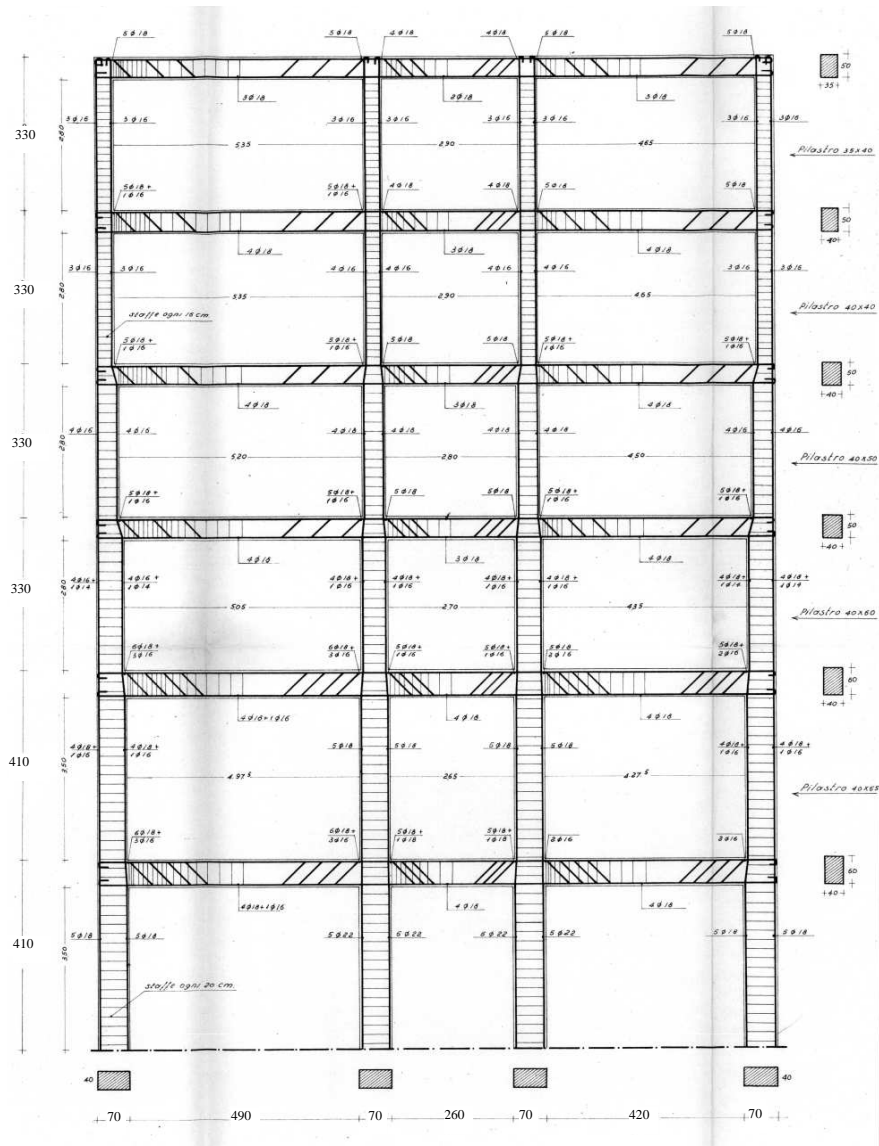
Dimensions of the typical frame and distribution of the reinforcement.
